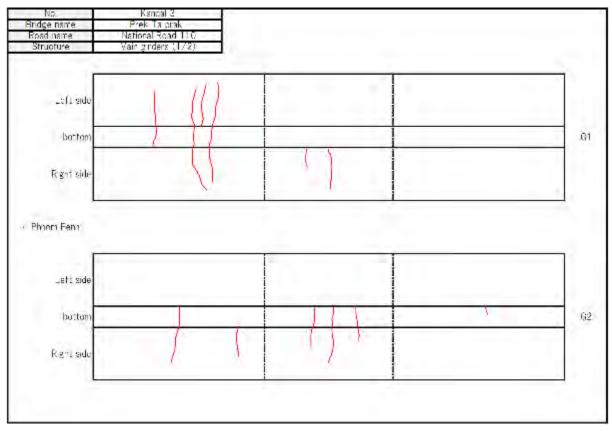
Inspection Sheet (Prek Ta prak: Kandal. Bridge No. 3)
